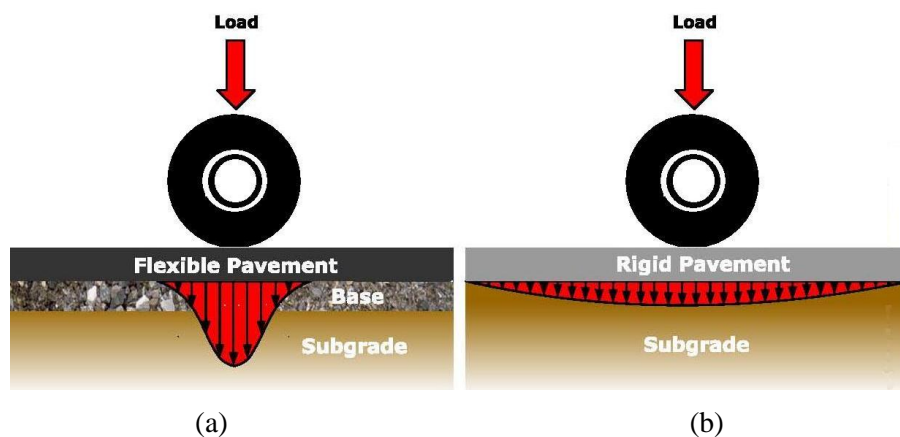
Stress distribution (a) Flexible pavement; (b) Rigid pavement
